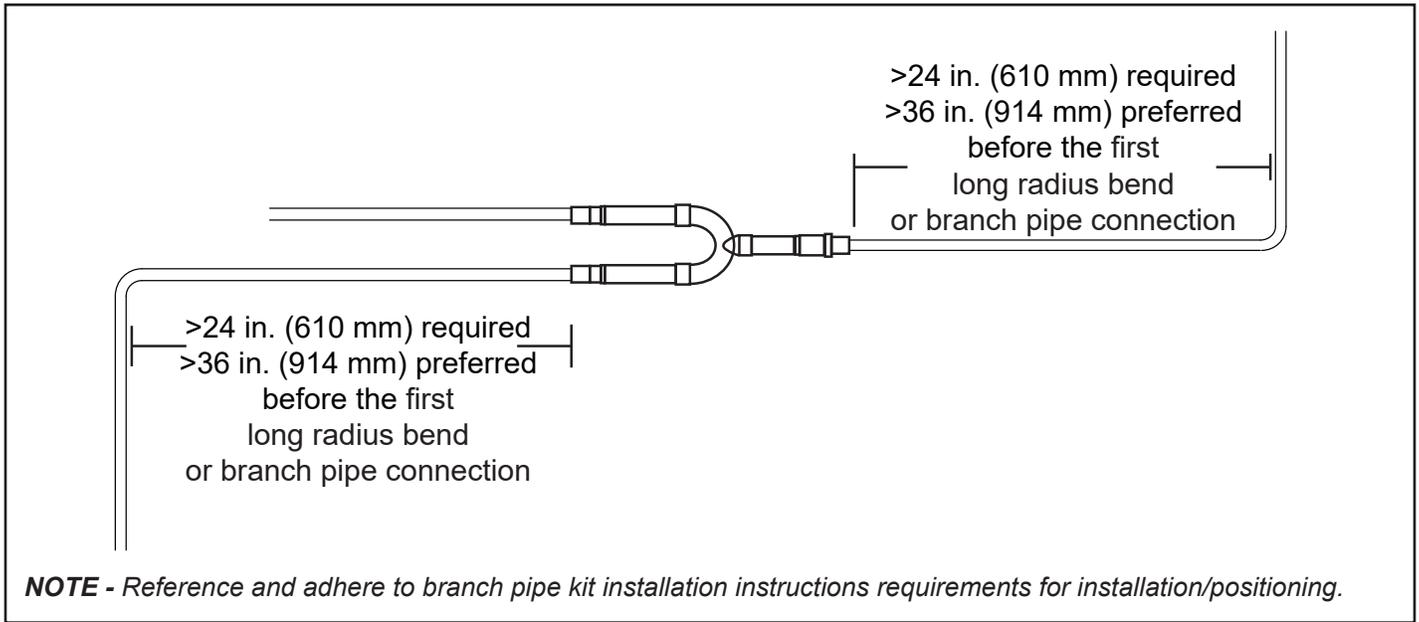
24 to 36 Inches of Straight Pipe Before and After Branch Pipe Kit
